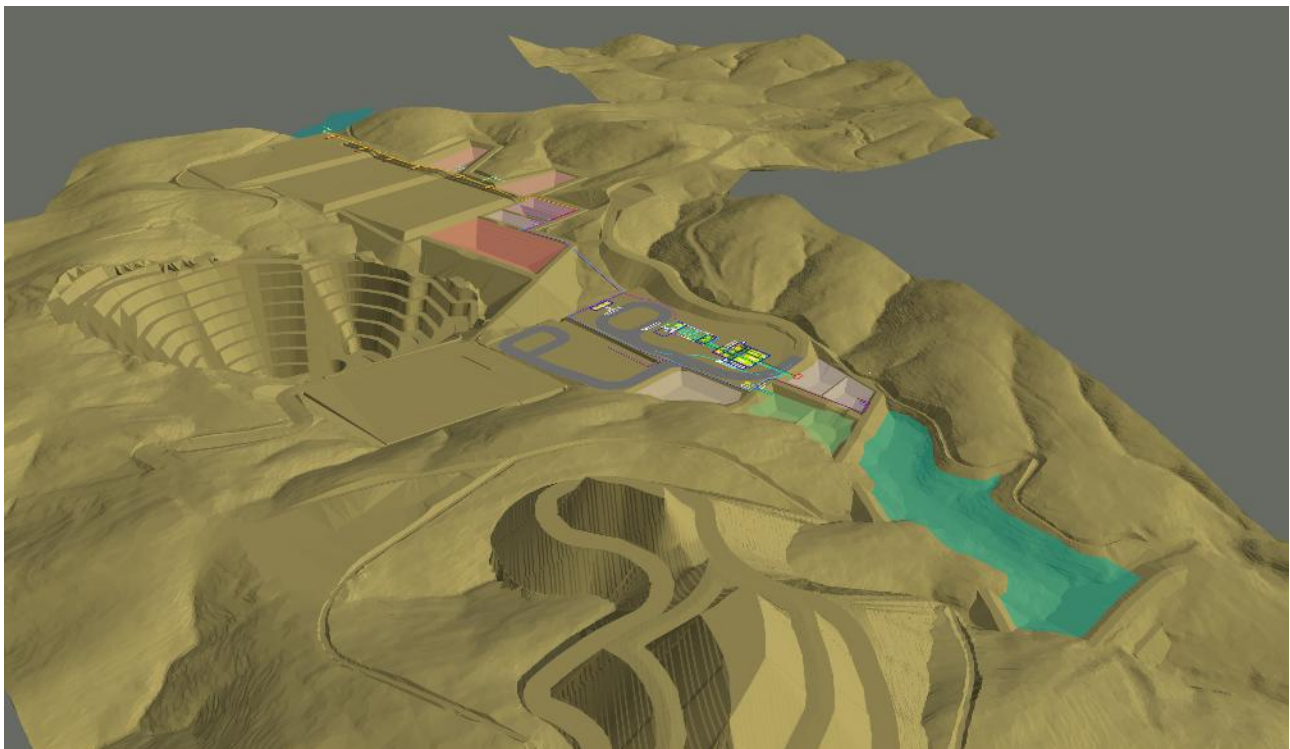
Location of Dianne SX-EW facility relative to heap leach pads within overall site layout (design images, construction not yet completed)
